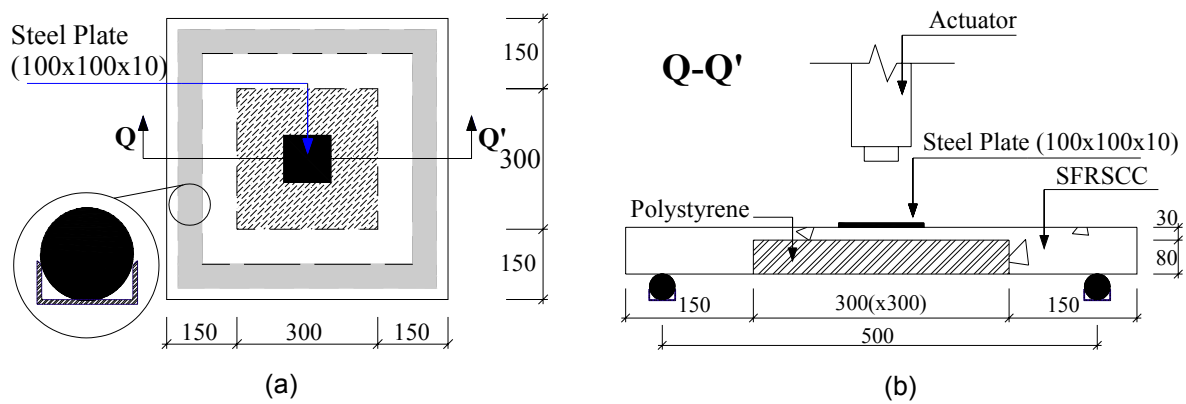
(a) Test panel prototype for the punching resistance and (b) test setup (dimensions in mm).
